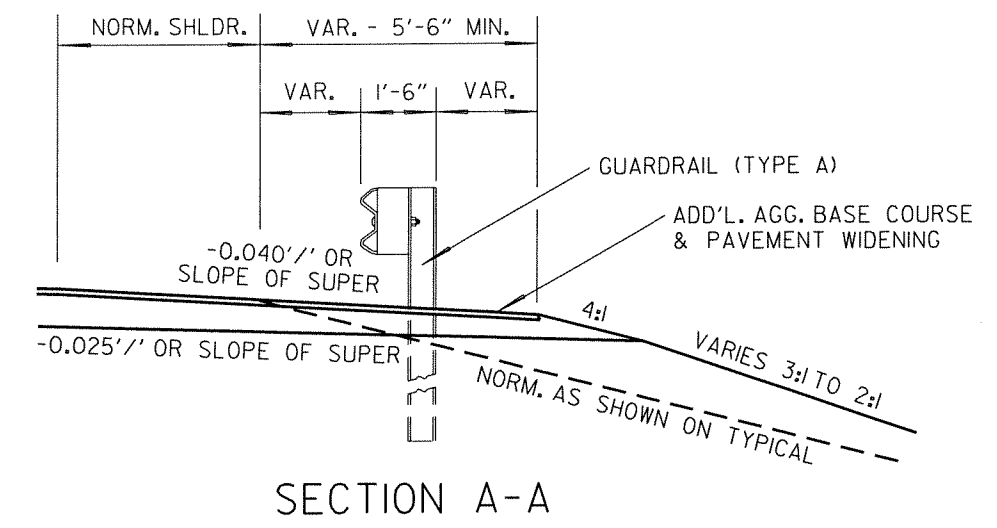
DETAILS SHOWING POSITION OF GUARDRAIL ON ROADWAY
